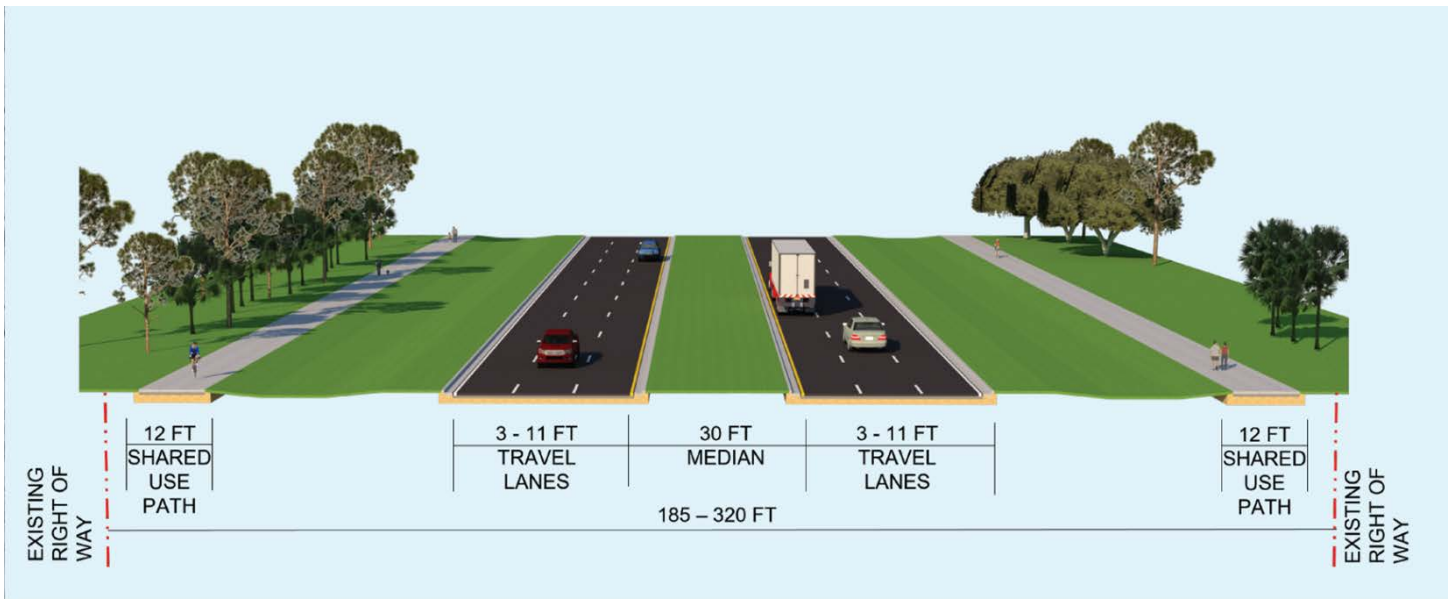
Preferred Alternative Typical Section between U.S. 92 and Tymber Creek Road
